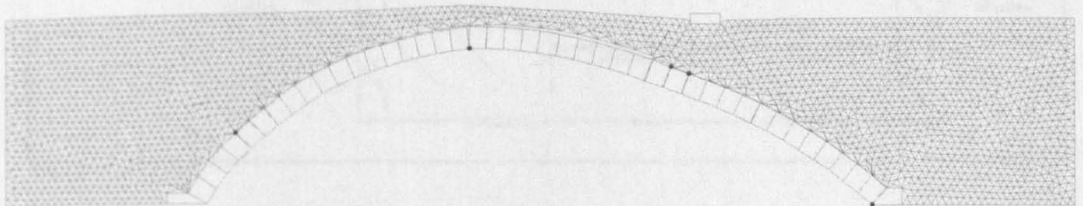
Prestwood Bridge: deformed shape of soil and arch
